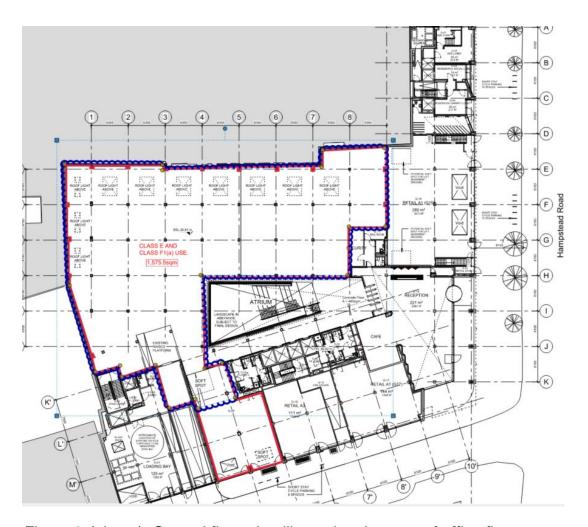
(above): Ground floor plan illustrating the area of office floorspace (denoted in blue) which is located in the northwest part of the building that forms part of the proposal.
